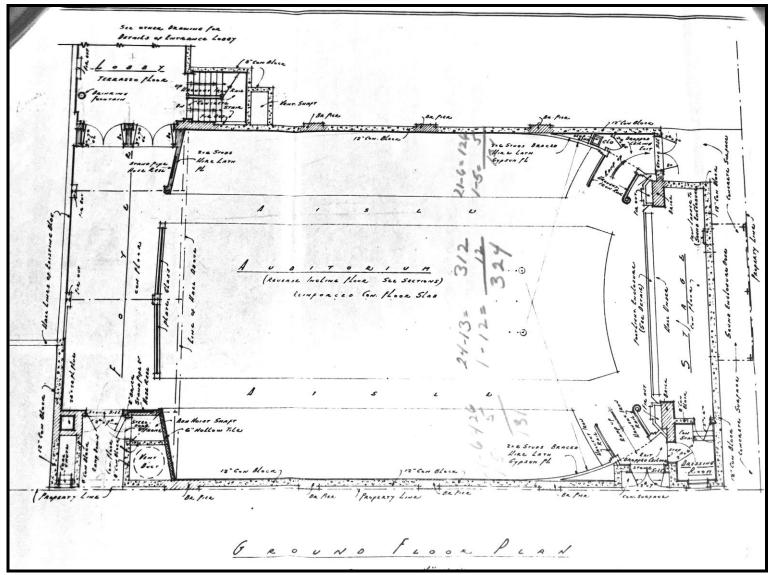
Ground Floor Plan of 1014 King Street West, Hamilton – Westdale Theatre (Photo provided by City of Hamilton; Riddell 1935i)
